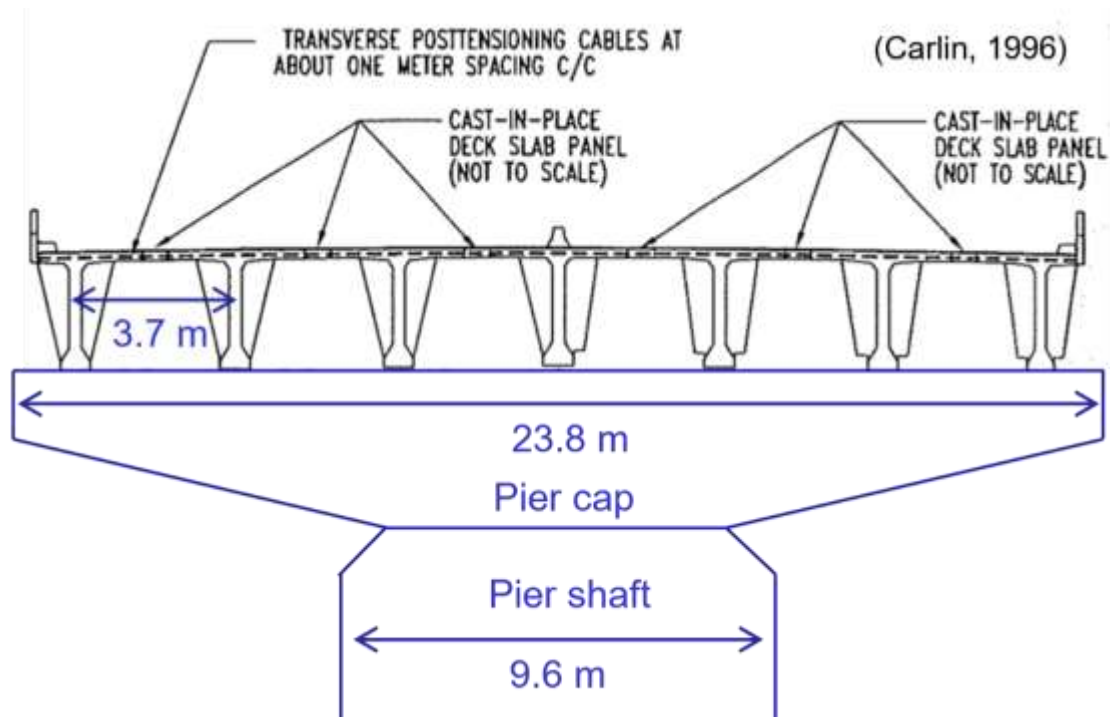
Schematic cross-section of the deck and girder sections from Carlin 1996 [3] modified to identify the location of pier cap and pier shaft members in a typical pier
